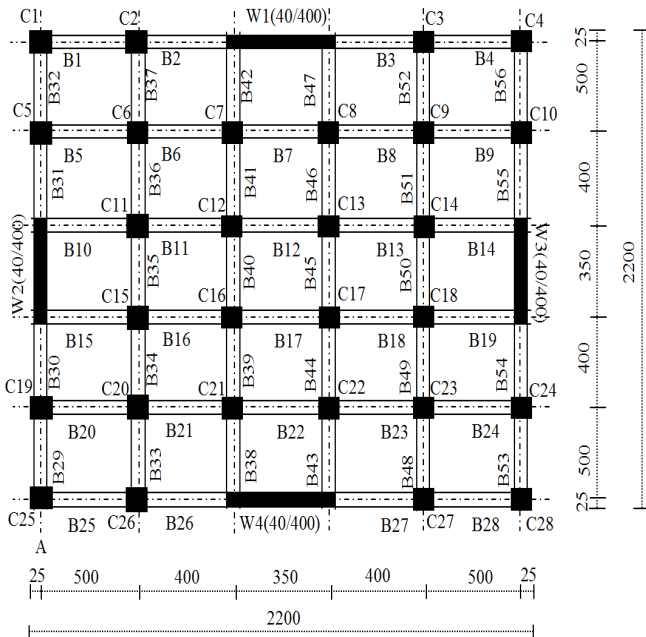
Lay-out view of the structural system no:19 (All dimensions are in cm.)
